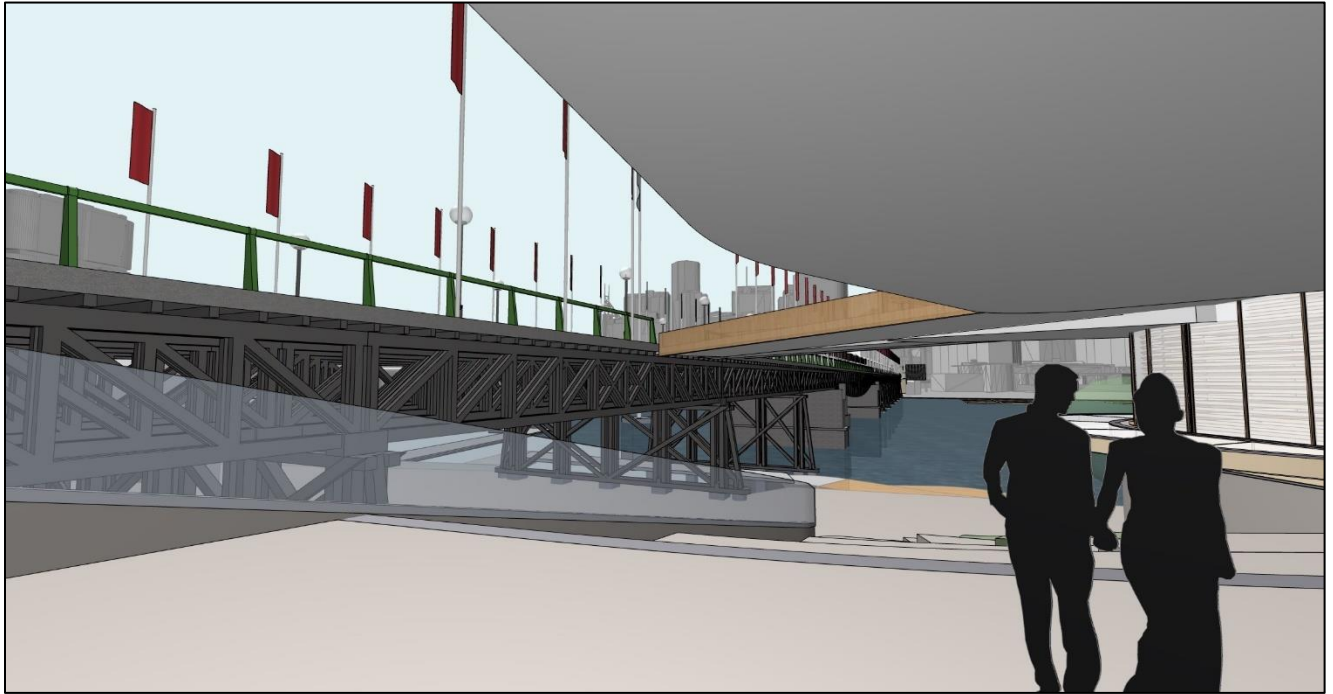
PROPOSED ACCESS POINTS TO THE BRIDGE AND TERRACED STEPS – LIGHT IMPACT TO FABRIC OF BRIDGE PROPOSED. (ALSO SEE FIGURE 28 THAT DEMONSTRATES PROPOSED BRIDGE.) SOURCE: FJMT 2016
